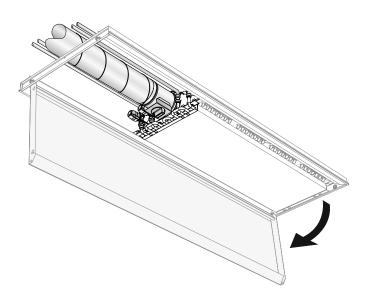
Example showing accessibility to an inactive section with straight horizontal connections when the face plate is open from its hinges.
